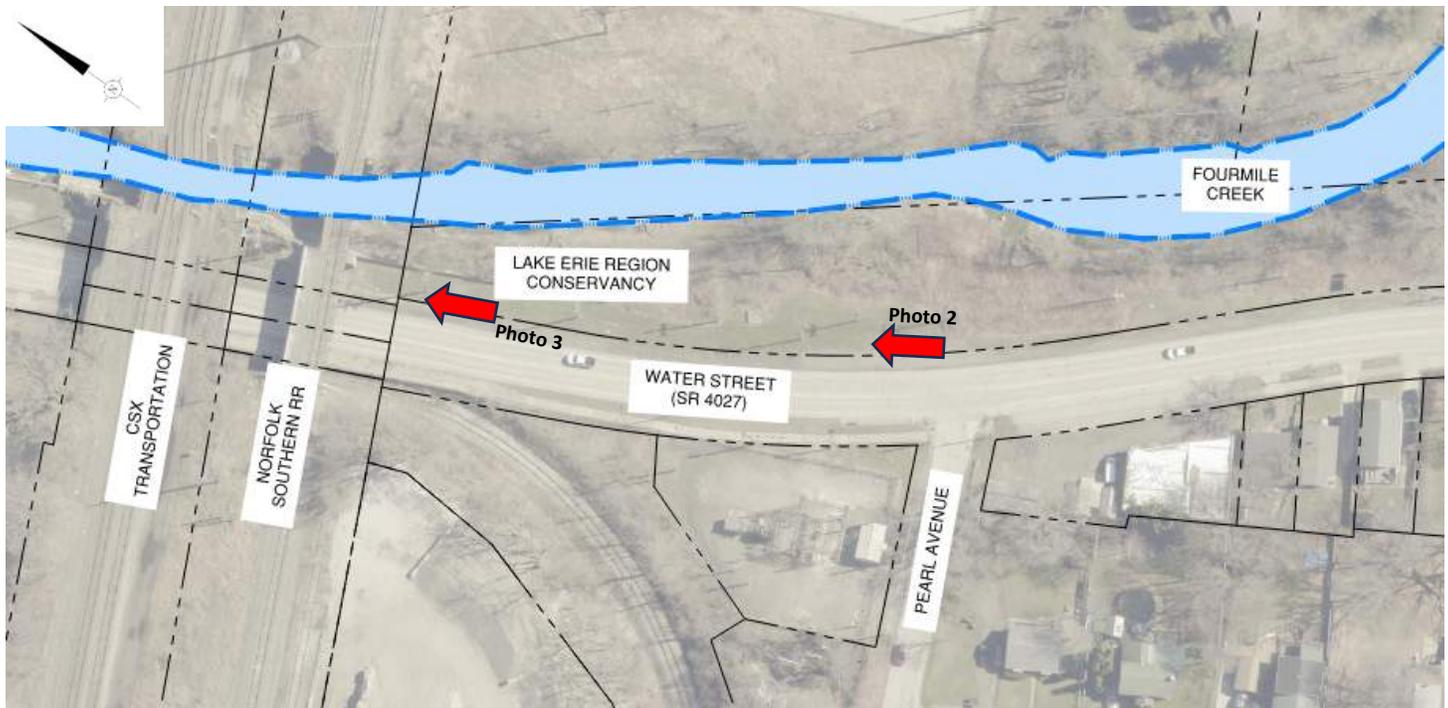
Existing conditions near Lake Erie Region Conservancy and railroad bridges (not to scale).
